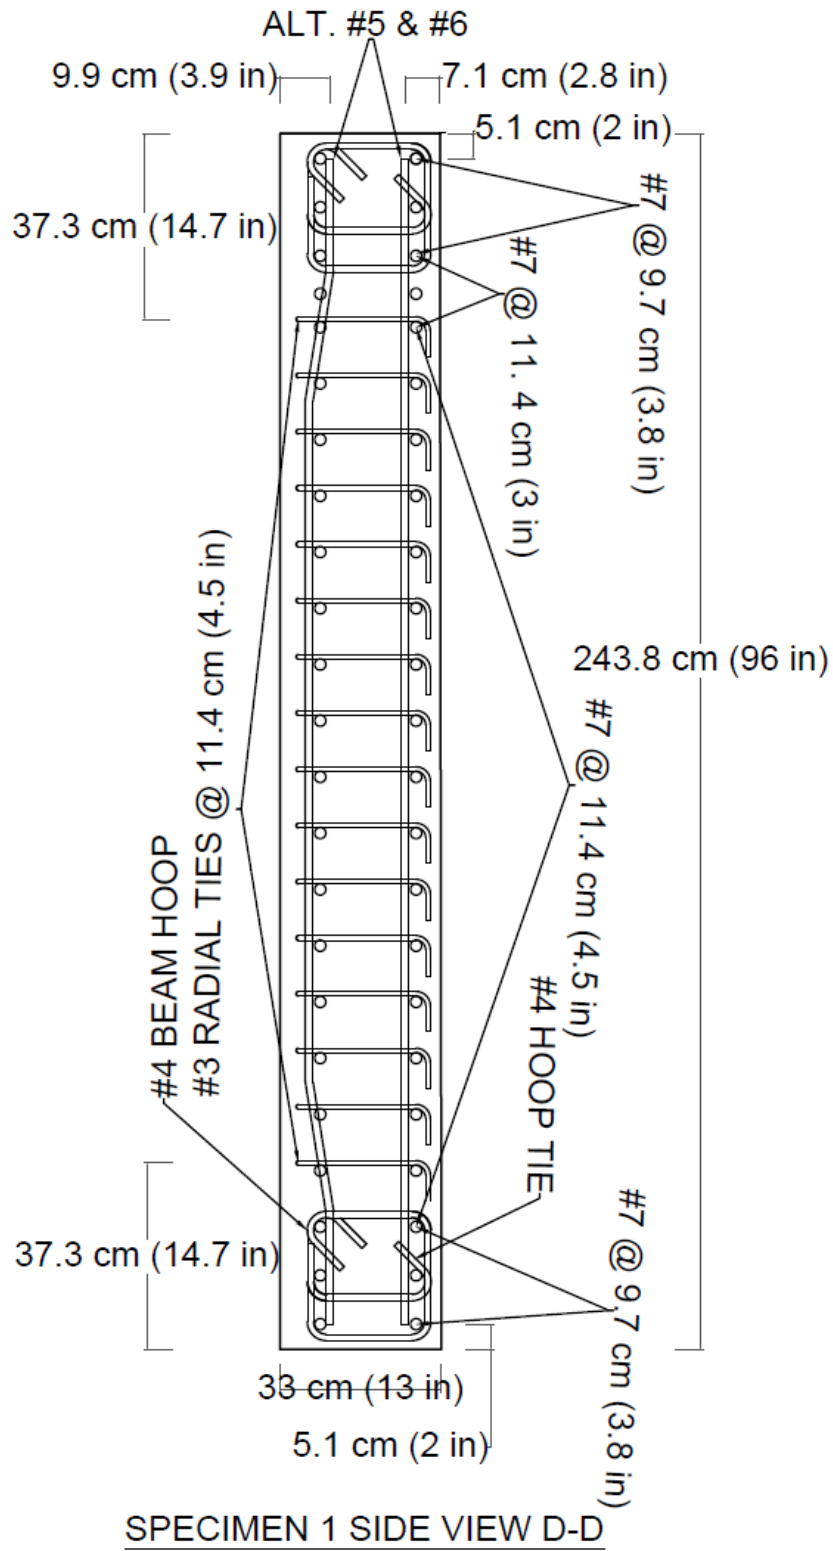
Specimen 1- Reinforcing Steel Layout Side View D-D
